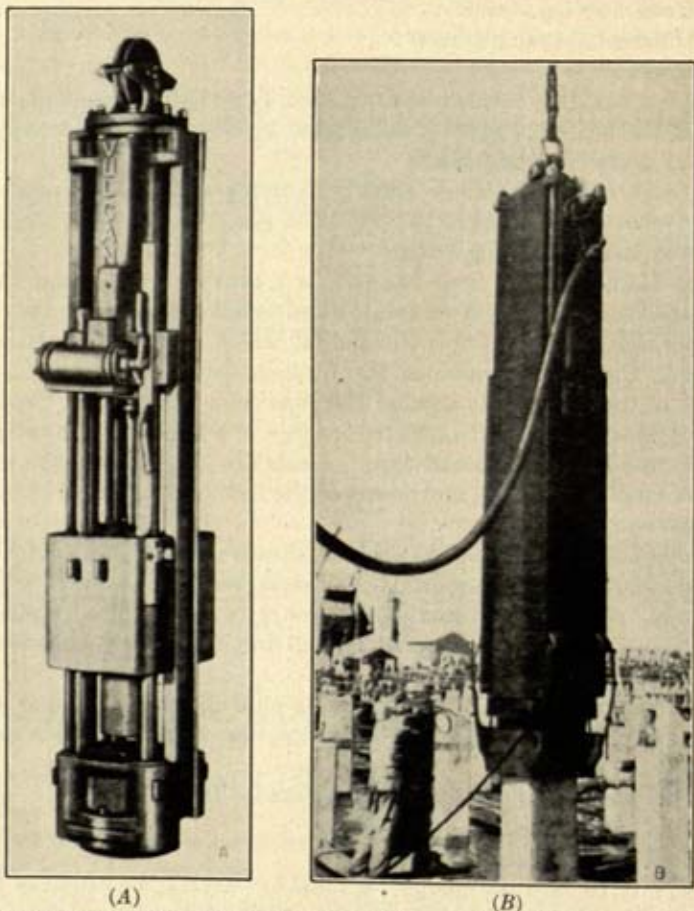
Single-acting steam hammers: (A) open type (Vulcan Iron Works); (B) enclosed type (McKiernan-Terry Corp.).
